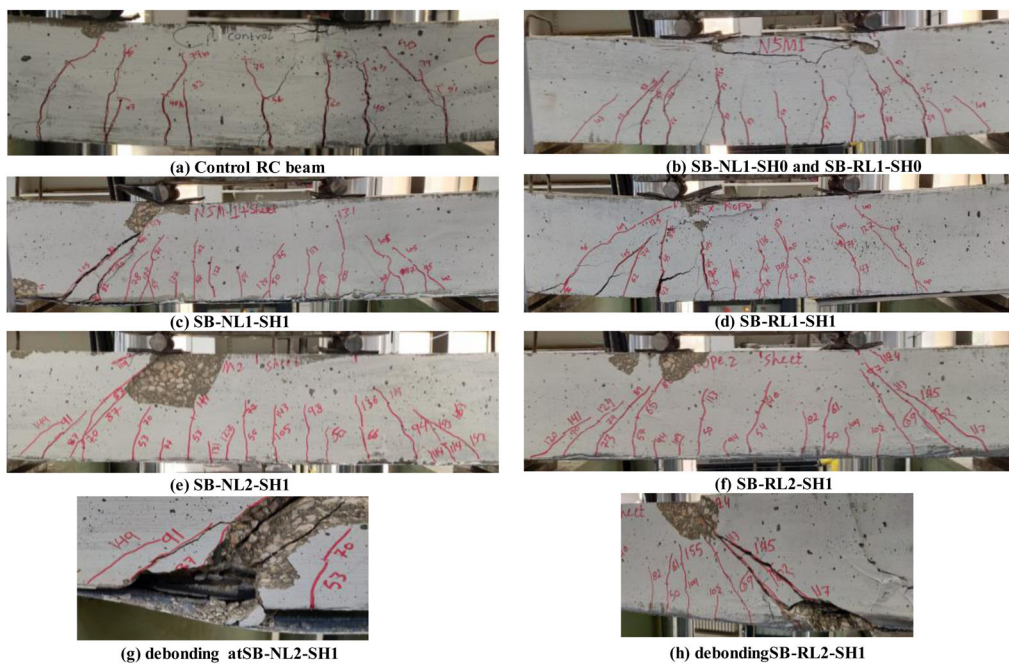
Cracks and Failure Mode of RC Beam specimens at failure.
